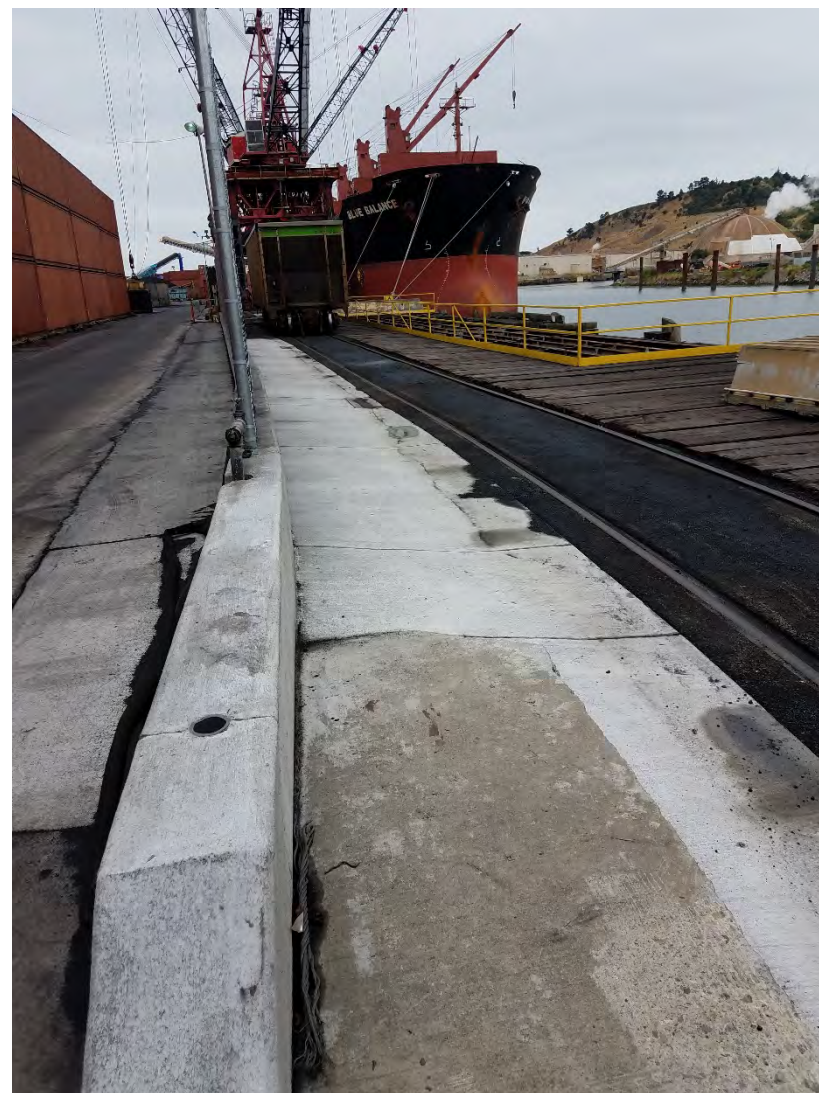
Looking south: new concrete work completed during 2016-2017 reporting year.
